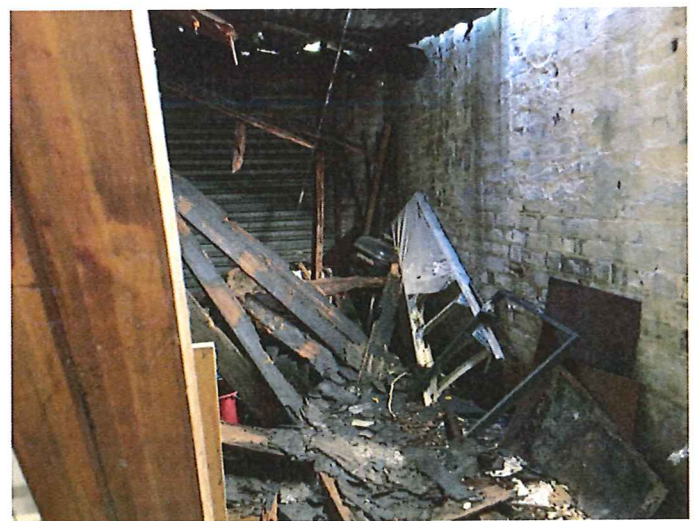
Interior of the garage in the south eastern corner, no access to the garage was available. Visual access was achieved through a missing brick in the wall
